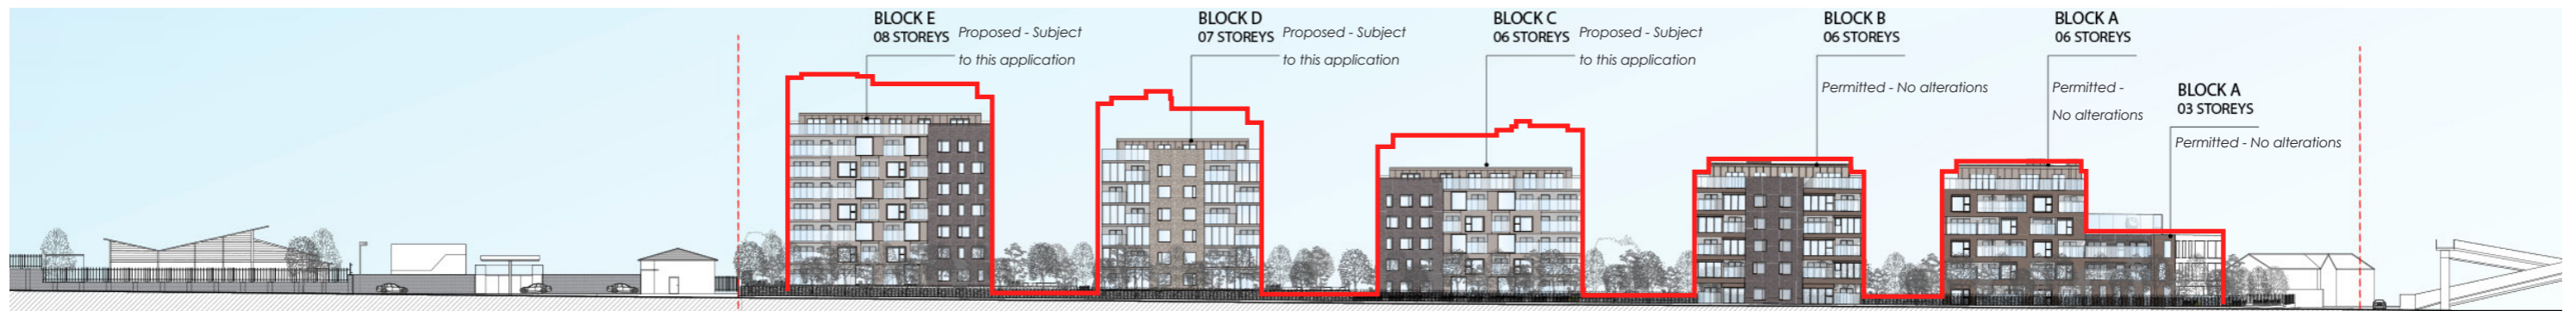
IMAGE : Permitted Contiguous Elevation - Reg. Ref. ABP-309899-21 - Not to Scale
